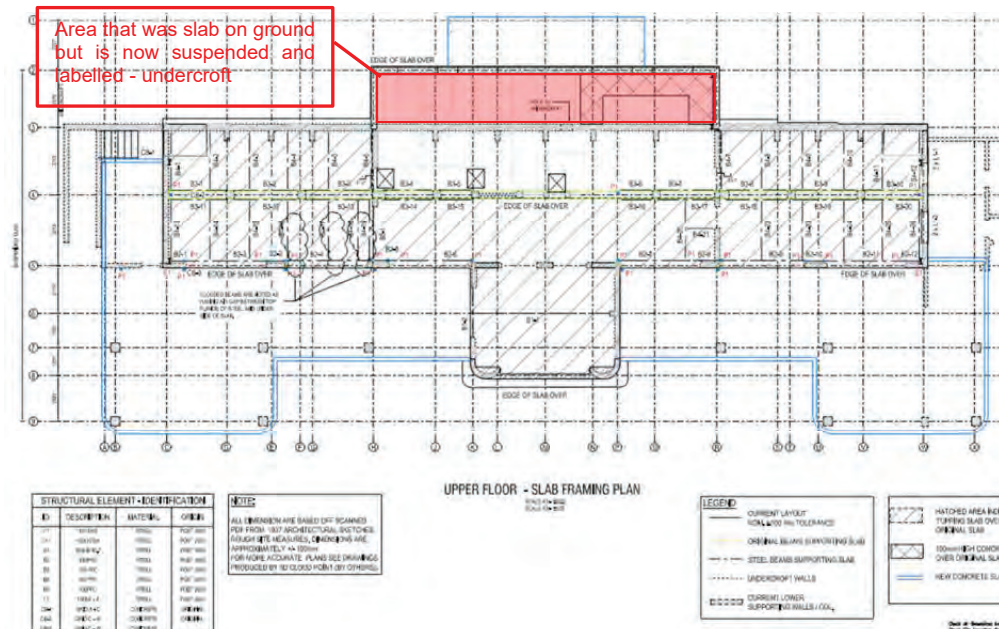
upper floor framing. Note highlighted undercroft area and topping slab hatched.
